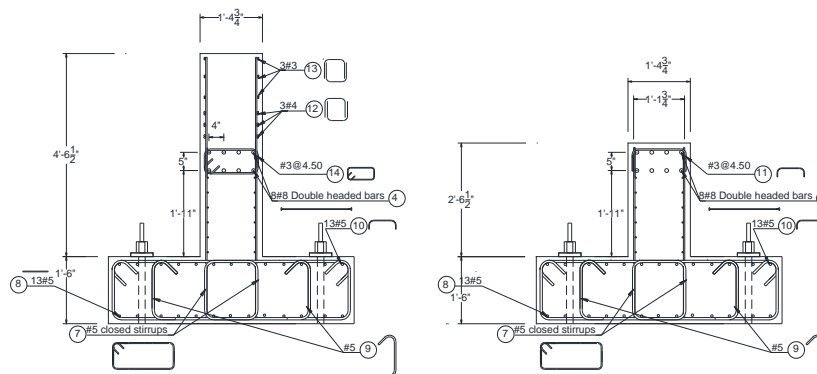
Sections E-E (left) and F-F (right) in design drawings for Specimen 9 (see Figure 6.6 for the location of the sections)
